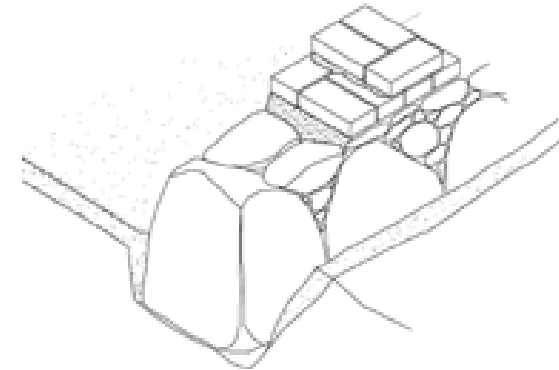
Clay wall on stone fundament, Mecca and Dipasquale, 2009
